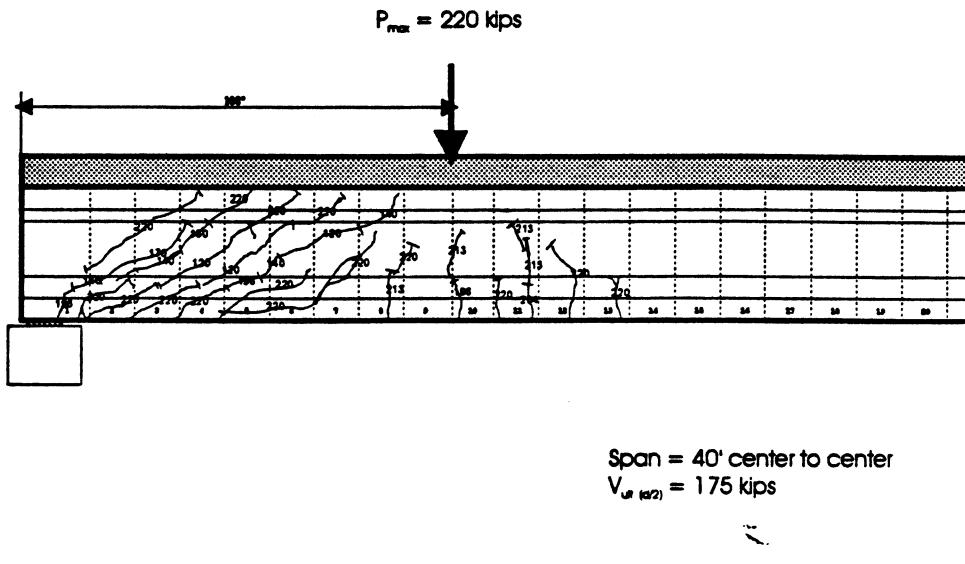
Cracking Pattern for Girder F8N
